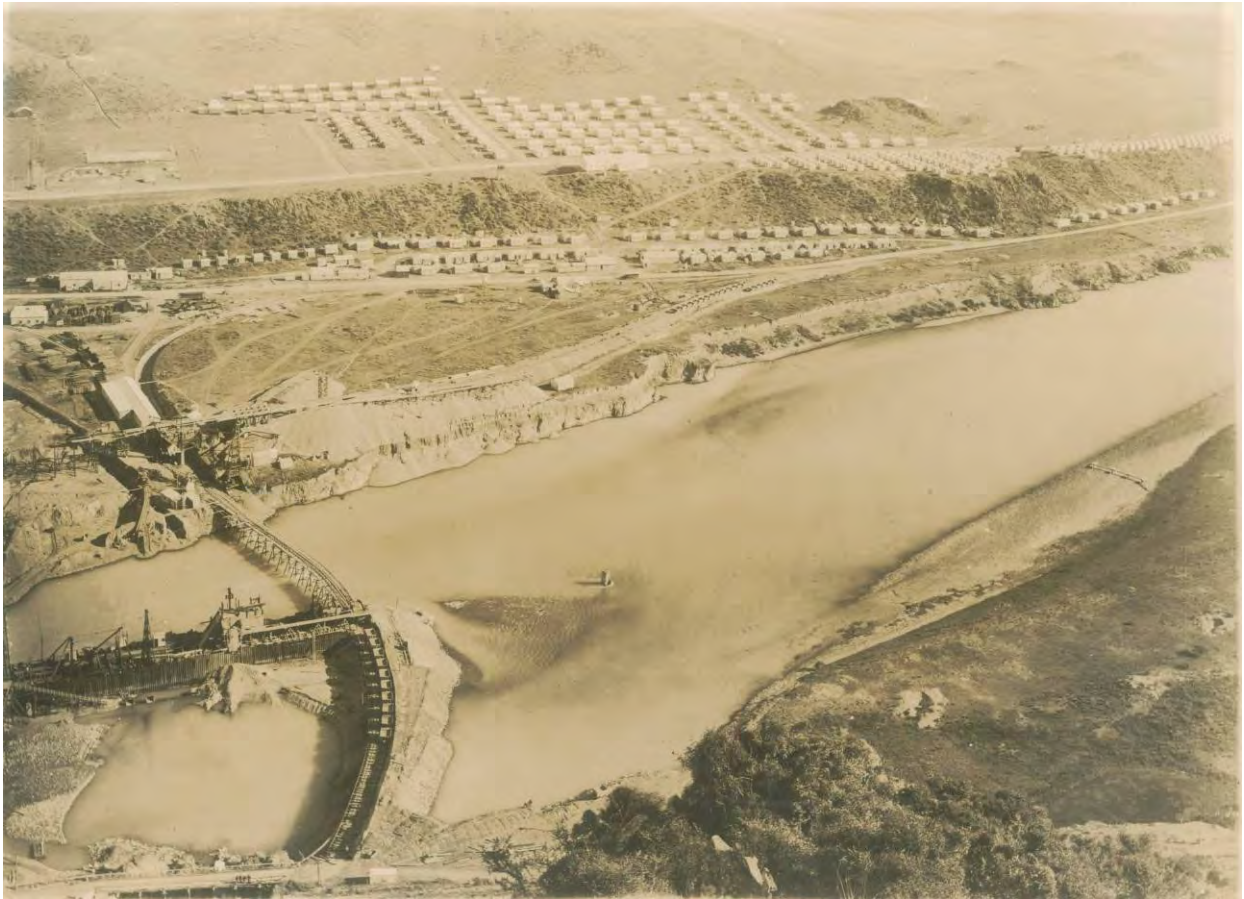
View of Block 14 Pier, Canterbury coffer dam sheet piling and earthworks constructed off the trestle bridge c1930
